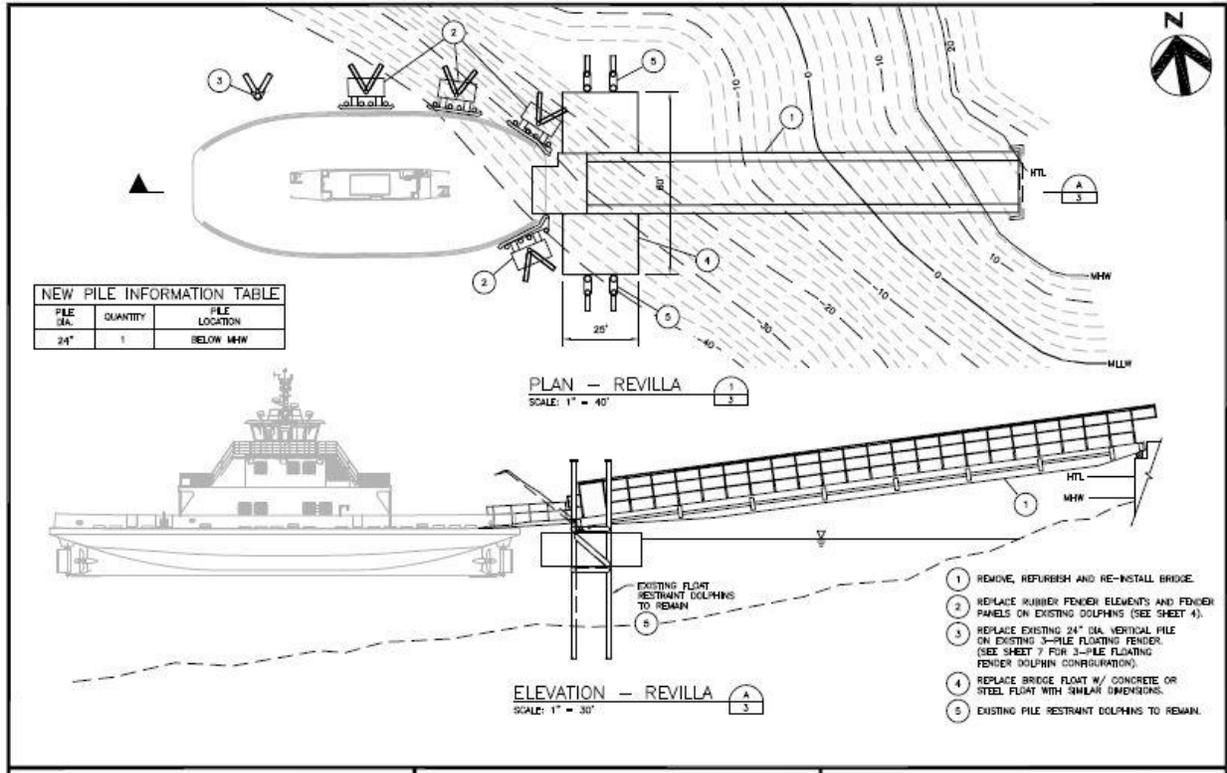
Plan drawing for refurbishment of existing Revillagigedo Island Ferry Berth (HDR 2023).
